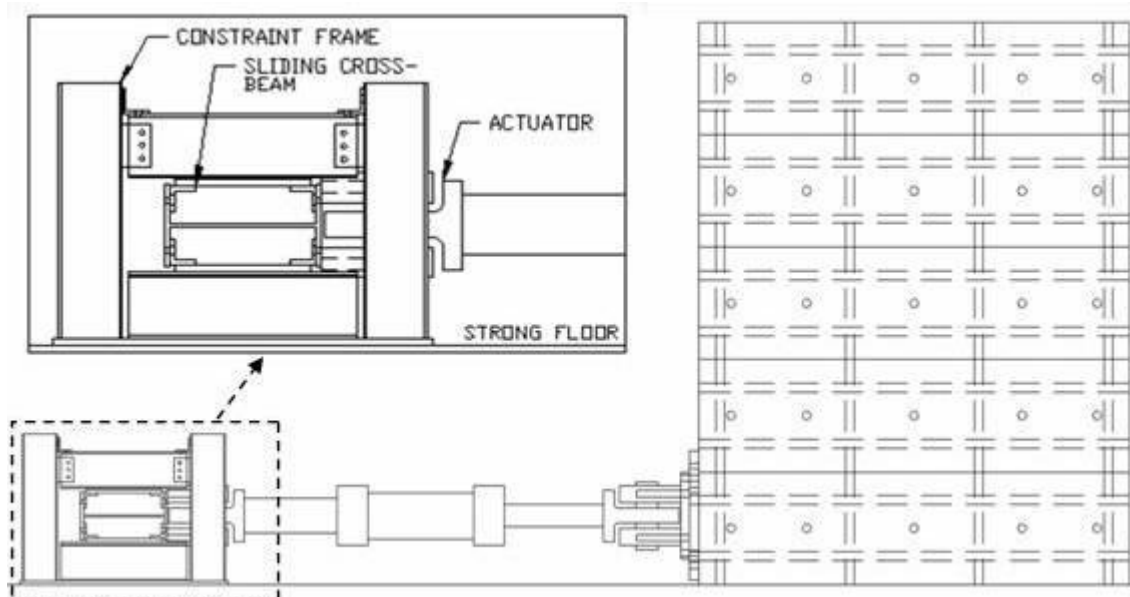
Elevation view of actuator, constraint frame and sliding cross-beam
